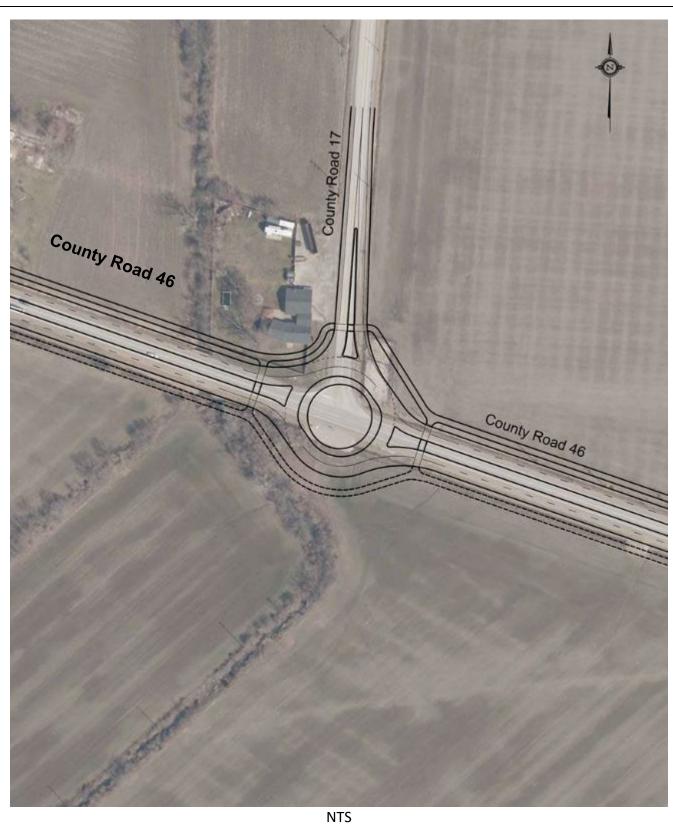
County Road 46 and County Road 17 Intersection Alternative B
